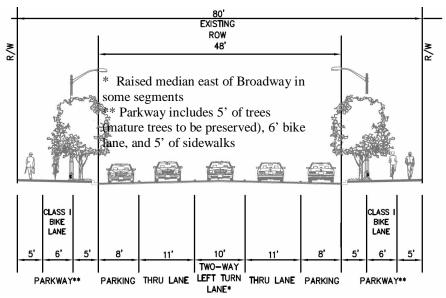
Proposed Cross Section, F Street Between Third Avenue and I-5
